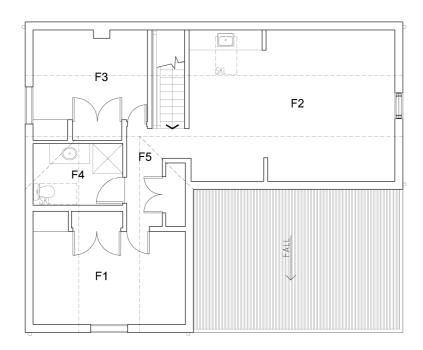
Coach House, first floor plan, not to scale. Source: Tanner Architects 2010.
